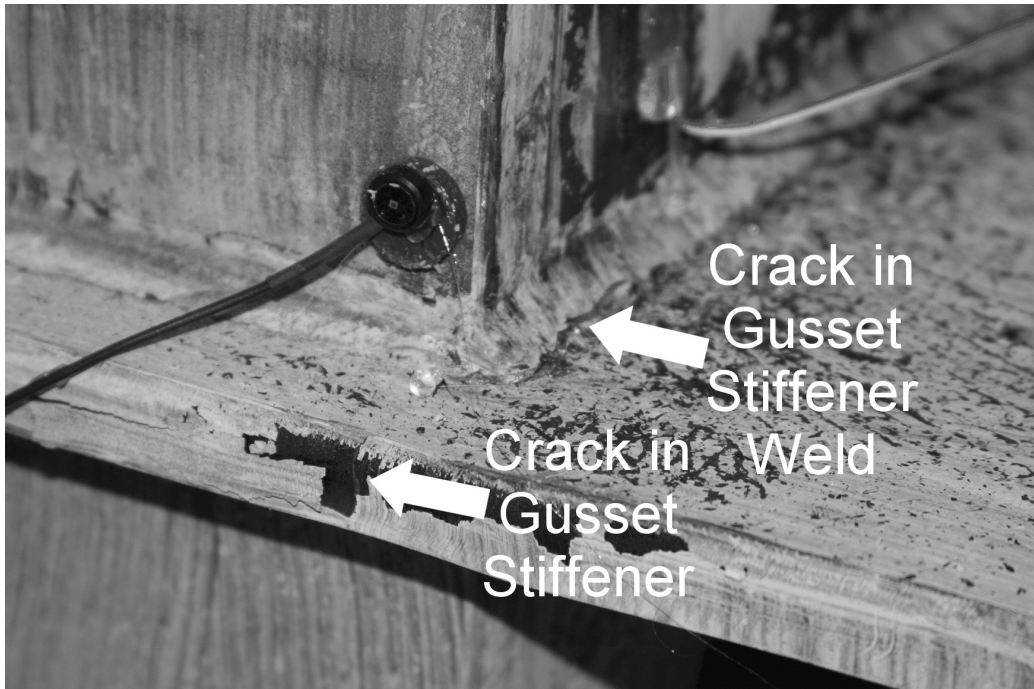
Initial Cracking of Bottom Gusset Stiffener and Weld on Specimen AX1L1.6 After Sequence 9
